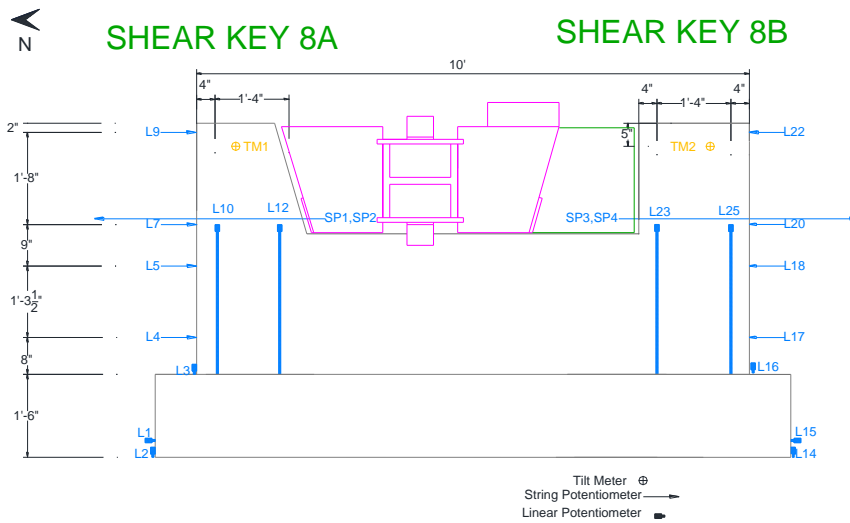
External instrumentation located on the west side of Specimens 8 and 10
